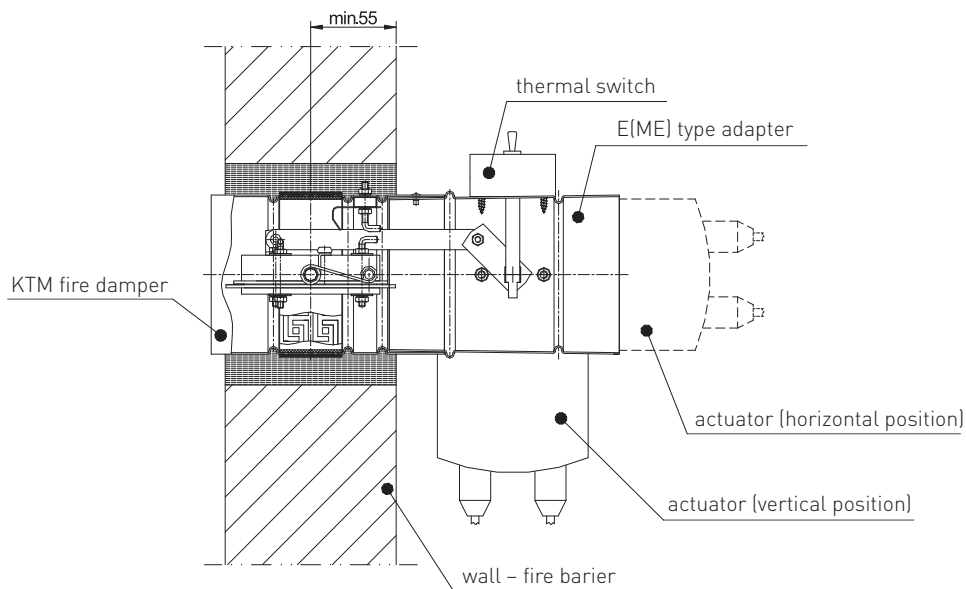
Installation of KTM-E(ME) fire dampers in fire barriers.
